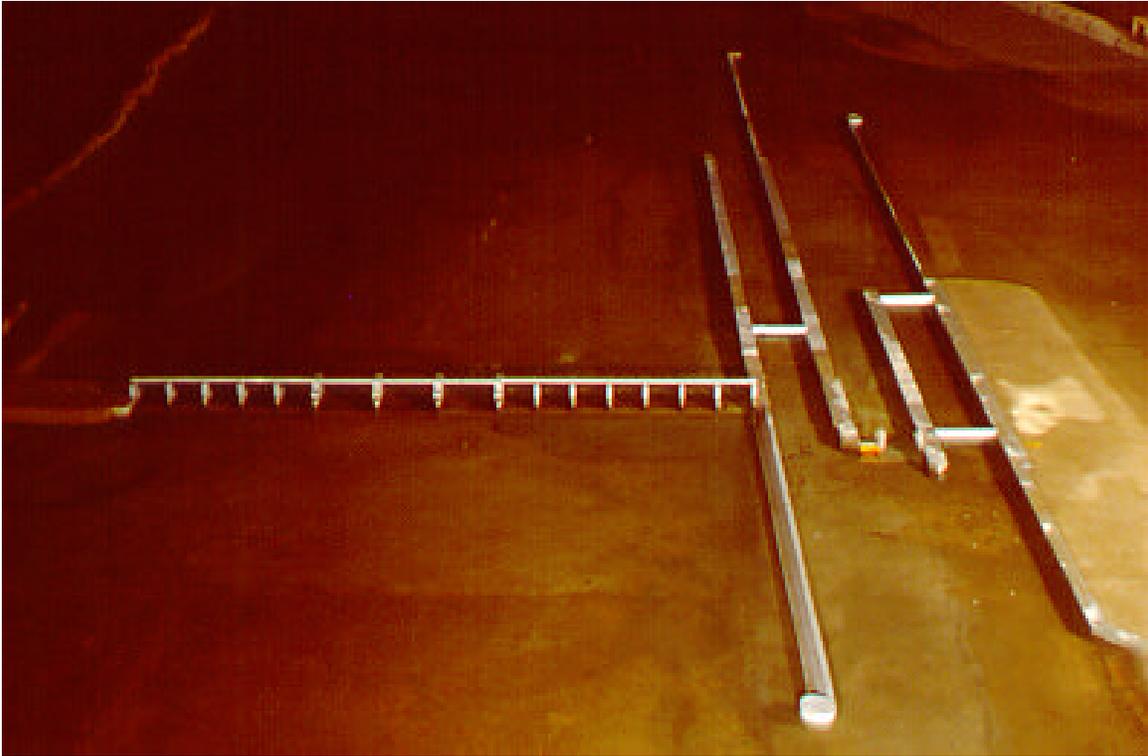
Lock Location 4, Plan A, looking downstream, showing structures
